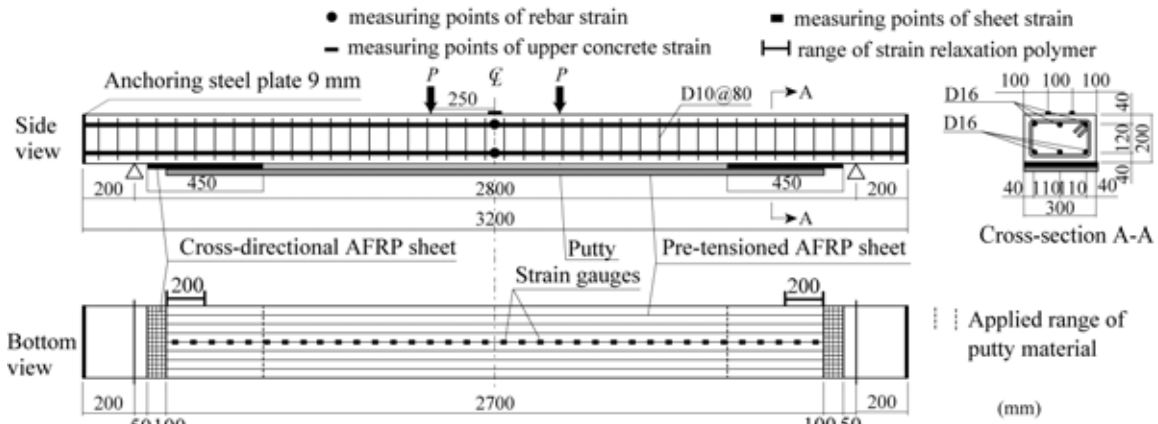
Layout of reinforcement and AFRP sheet for RC beam
